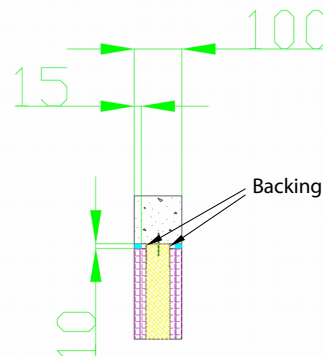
wall gypsum to stone thickness ≥ 100 mm
